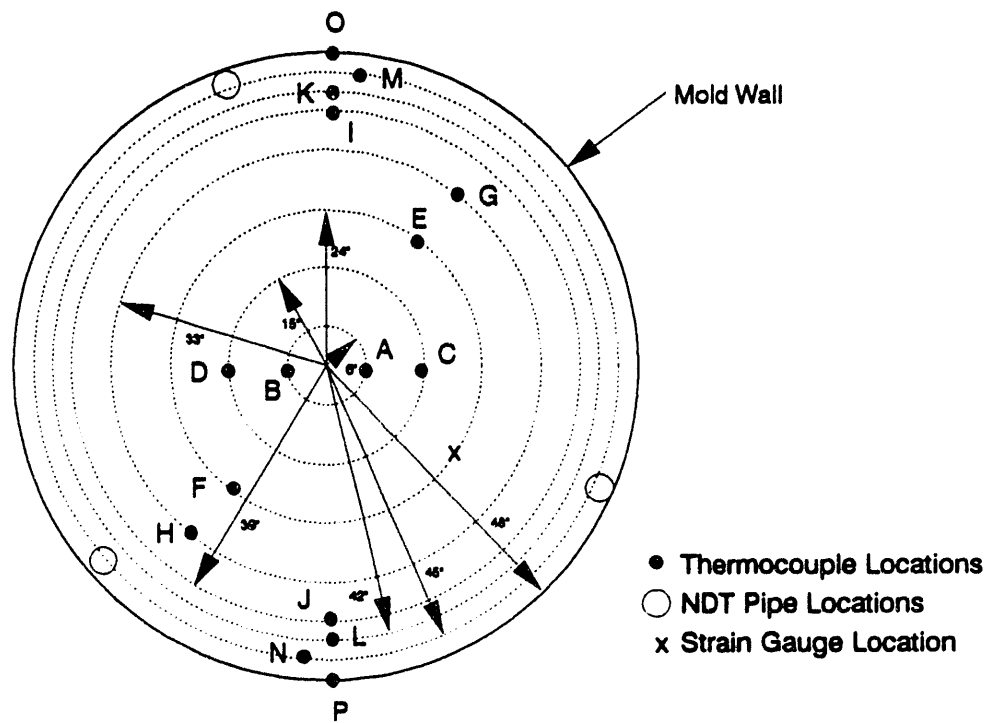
Thermocouple Placement in Gradient Mold
